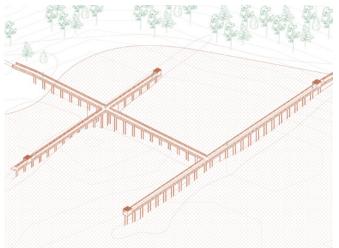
Elevated Boardwalk Over Tailings Trail Isometric
